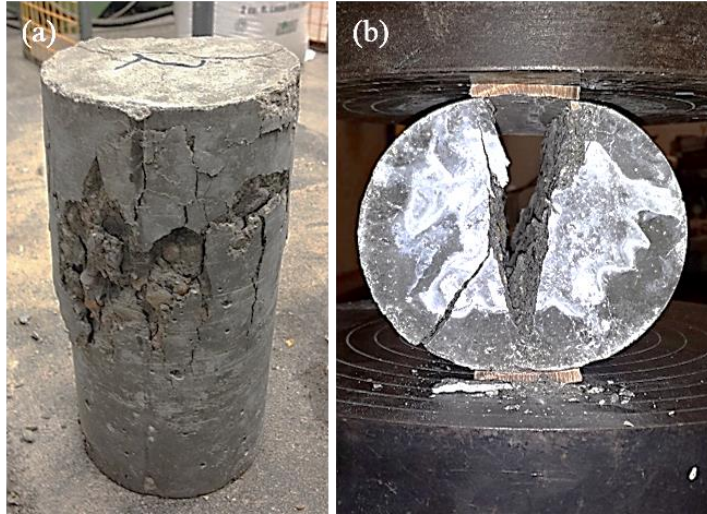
Typical Concrete Cylinder Failure: (a) Compressive Strength Test; (b) Splitting Tensile Test
